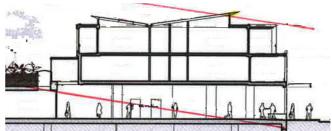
Building height non-compliance as viewed through a typical west facing cross section *Source:* Adapted by author from Plan No. DA11 dated 19 October 2012 as prepared by PBD Architects
